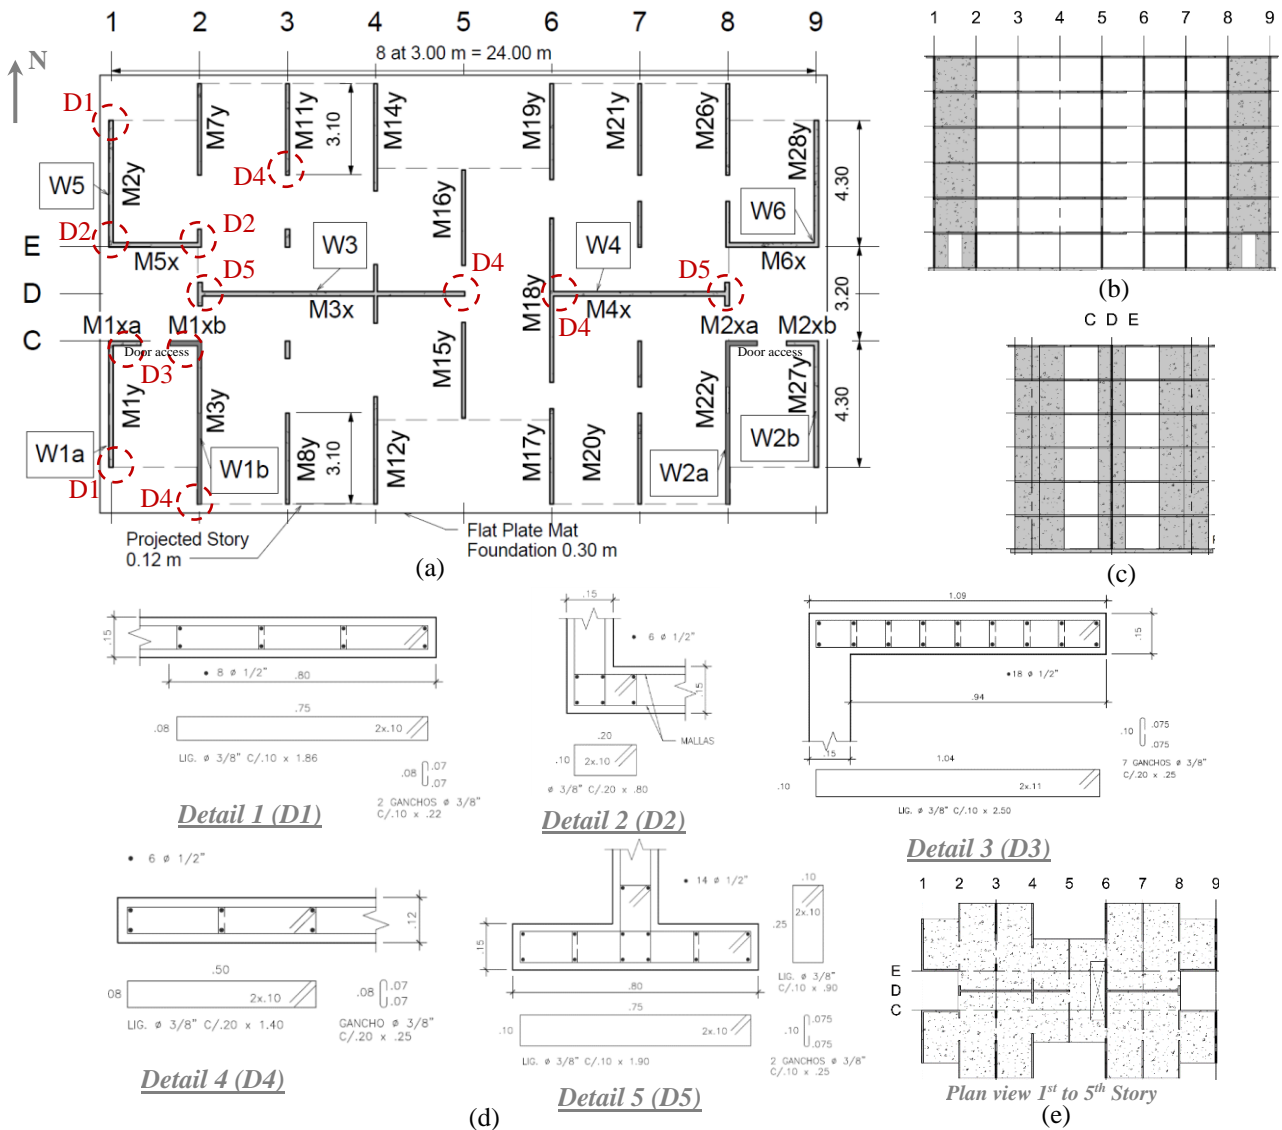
(a), (e) Plan views; (b) Elevation Grid C; (c) Elevation Grid 4; and (d) Boundary Element Detailing.
